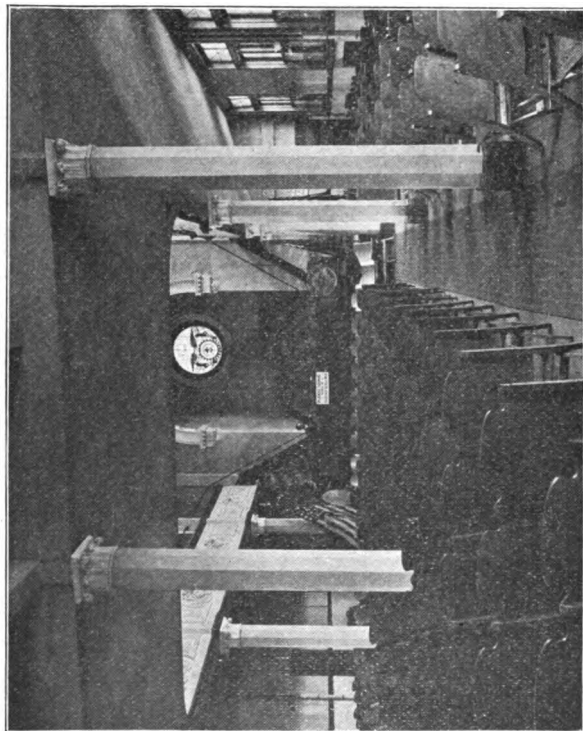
Balcony of Reinforced Conc rete. Auditorium, Salvation Army Building, Cleveland, O.
